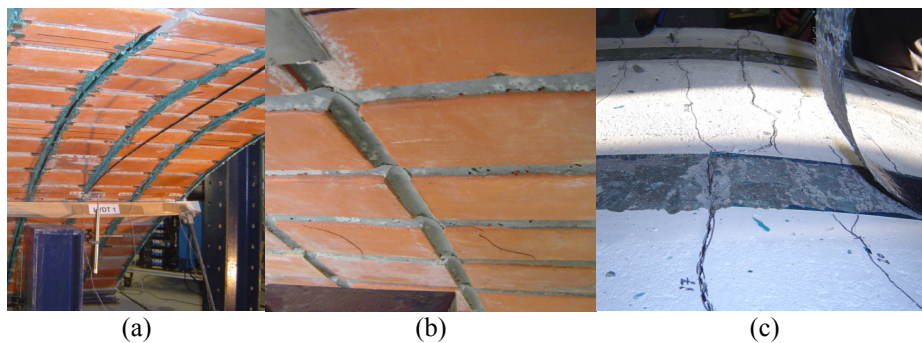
Failure mechanisms of the strengthened shell: (a) detachment of the CFRP strips; (b) crushing of brick units; (c) peeling of the CFRP strips
